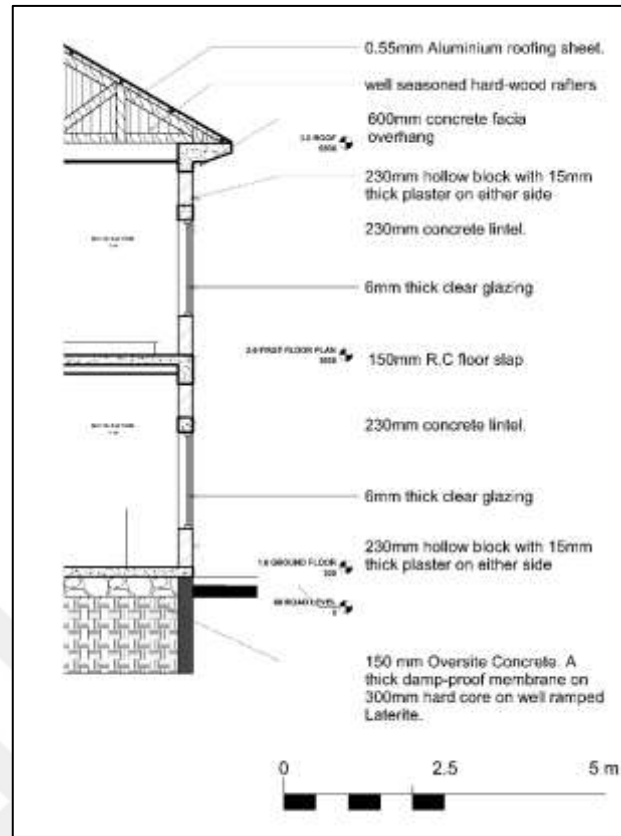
Envelope Detail of the Base Model, (Authors Sketch; Revit 2024).
